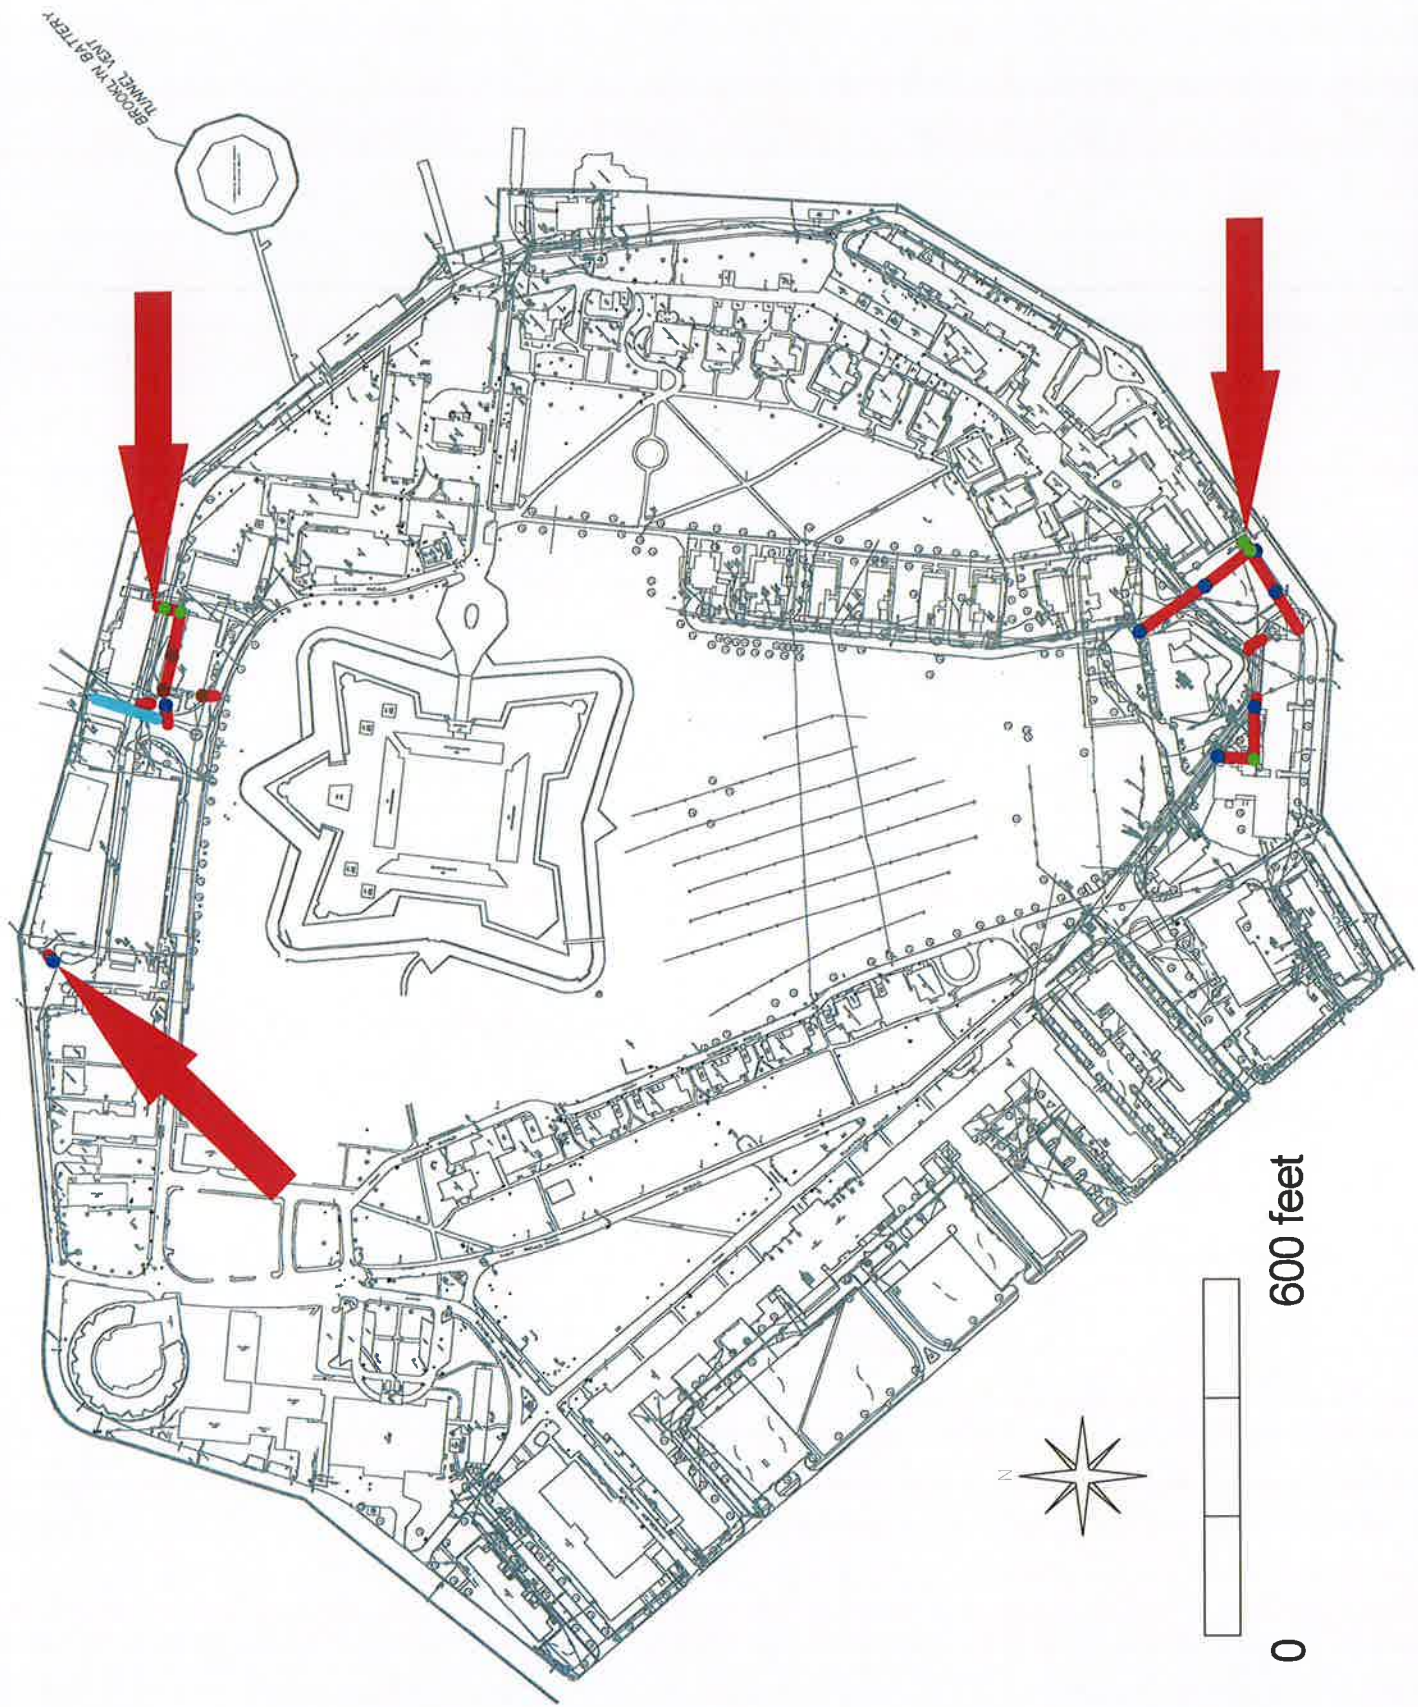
Location of storm drain excavation monitoring, showing French drain (cyan), manholes (green), catch basins (blue) and area drains (brown).
